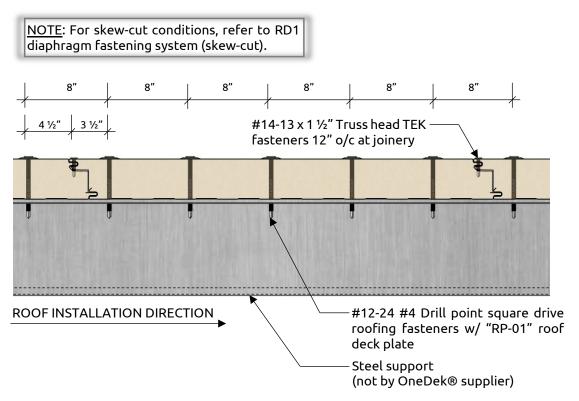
RD1 Diaphragm fastening system (40/5-12) (Section view)
